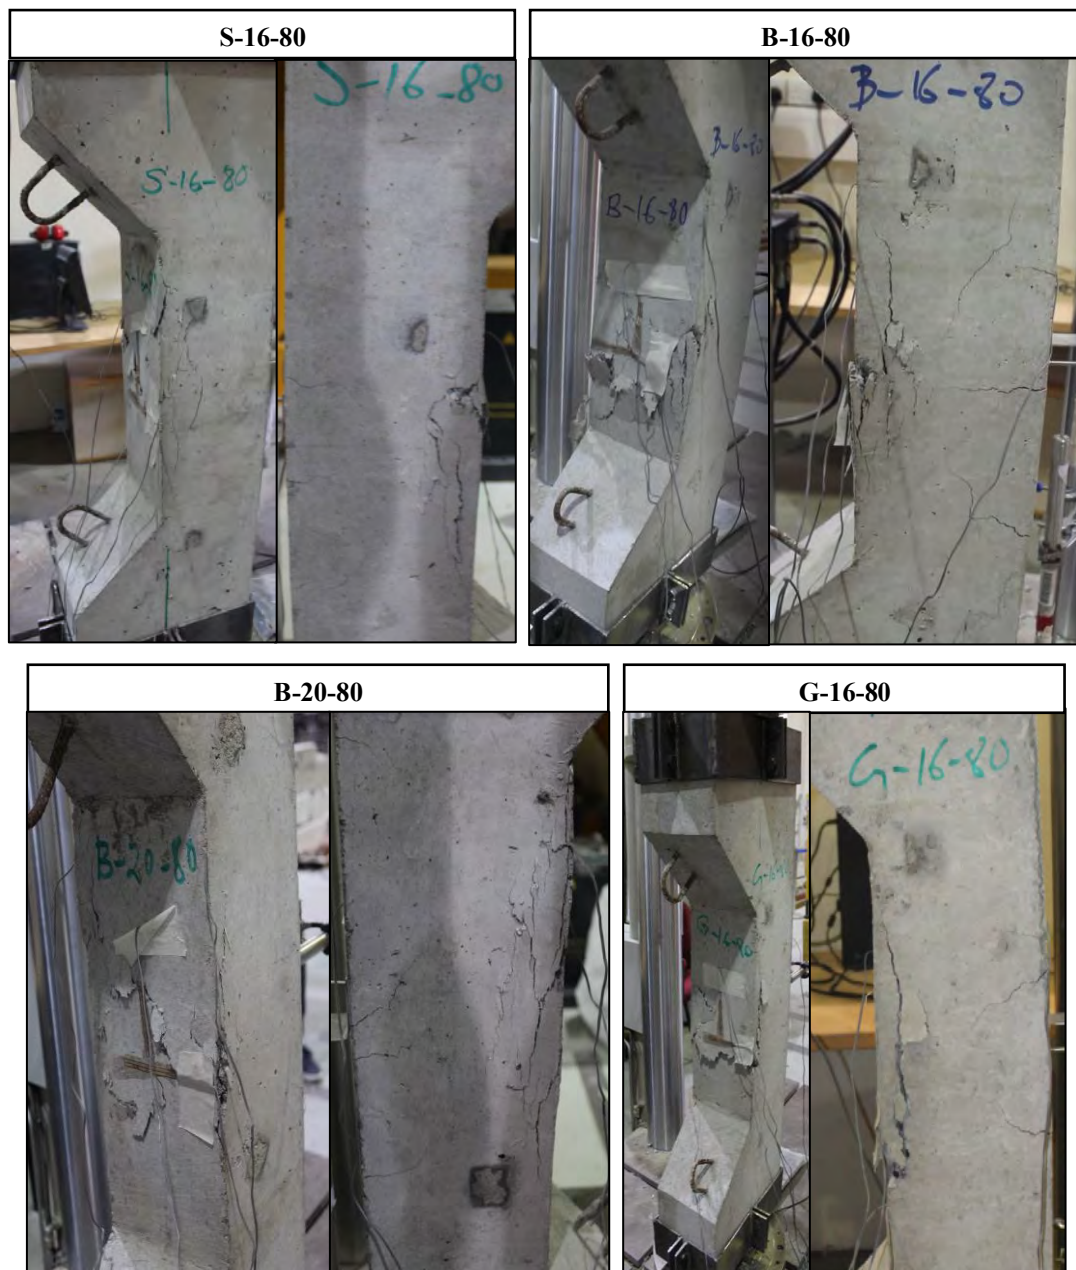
Photos of Group 1 column specimens tested under 80 mm eccentricity, after failure
